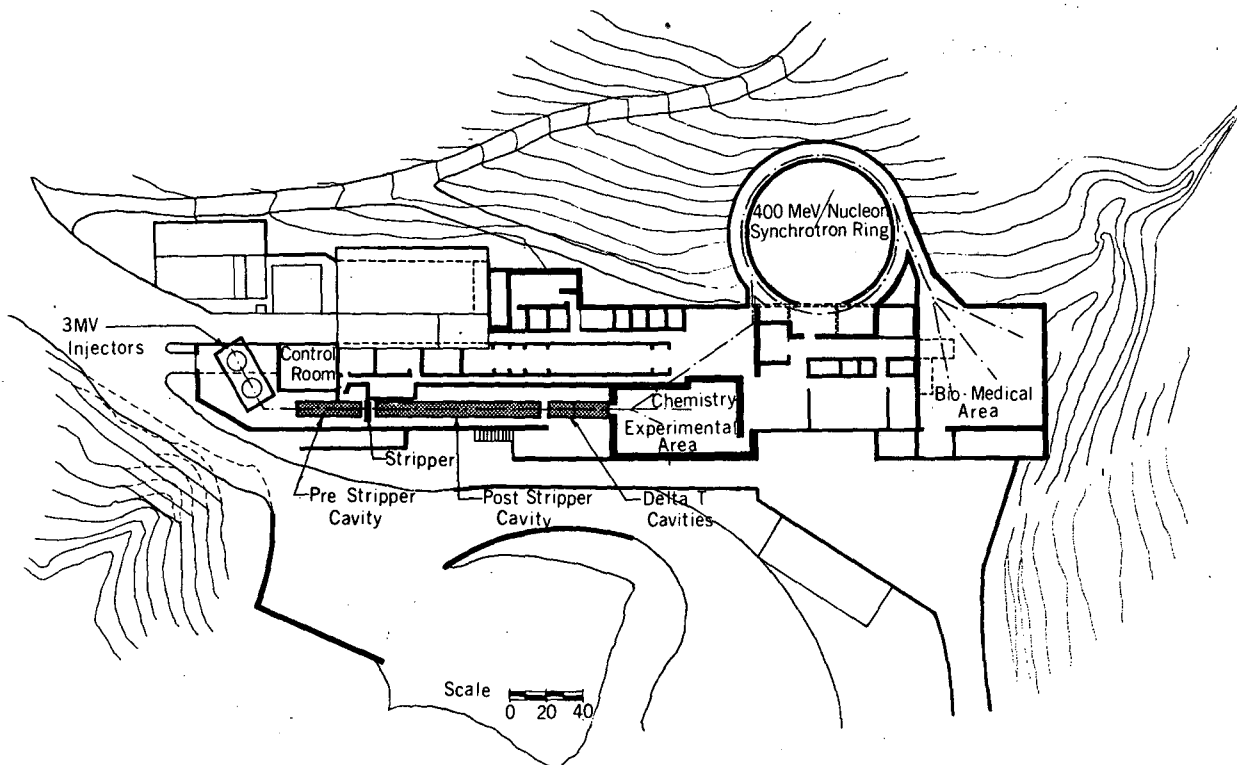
Plan of proposed Hilac and biomedical synchrotron facility.
